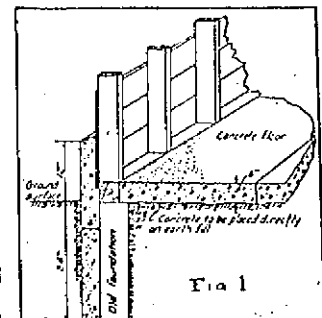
How an Old Foundation May Be Ratproofed and a Concrete Floor Installed.
